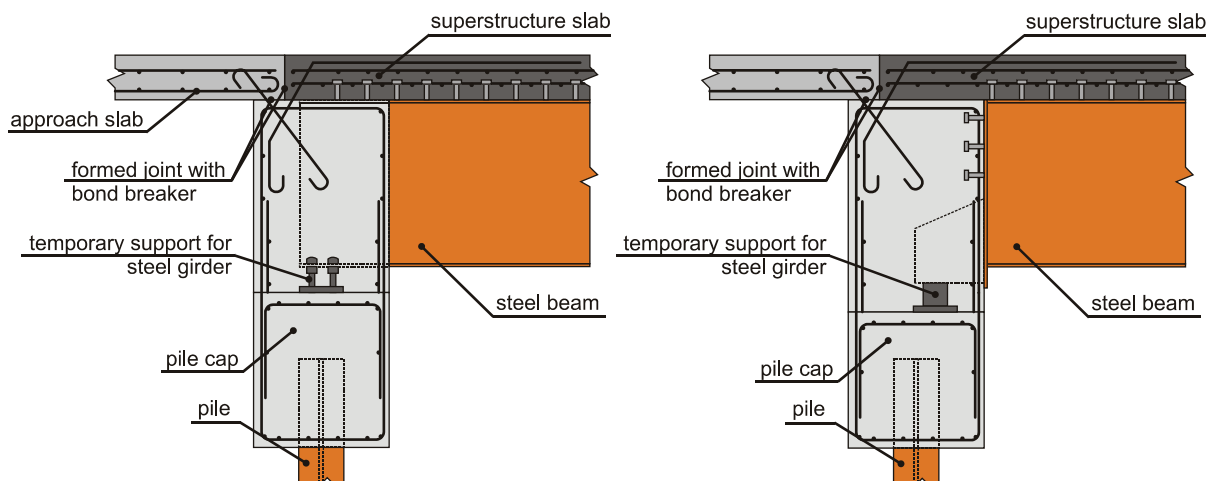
Girder mounted on levelling bolts / pressure plate on top of a pile cap
